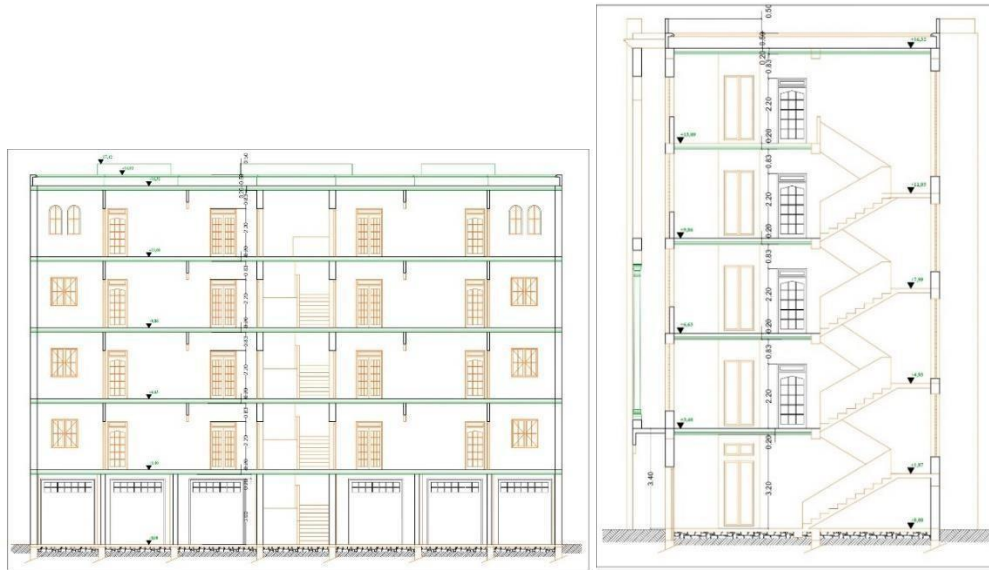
Sections of bar block (Source: design office Nebar Omar +Author treatment , 2025).
